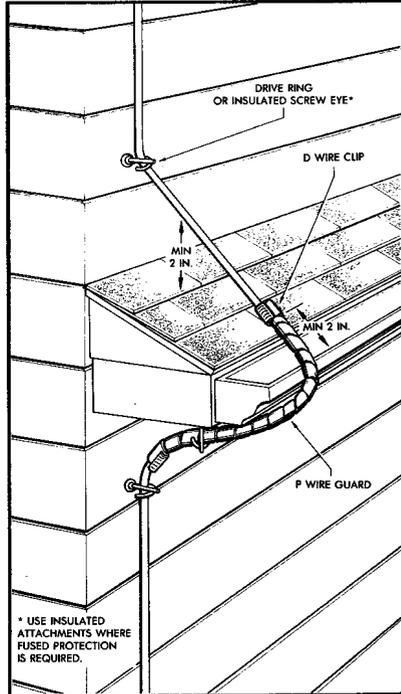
Drop Wire Crossing Building Overhangs and Gutters
